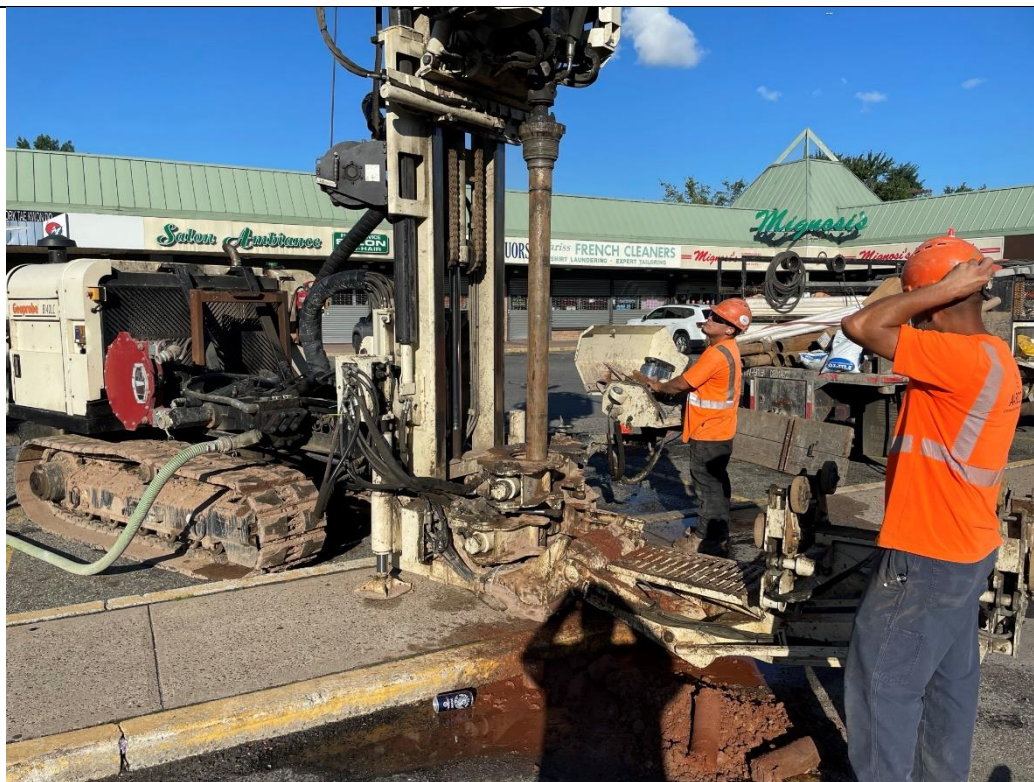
View of AARCO drilling LSB-17, facing northwest.
